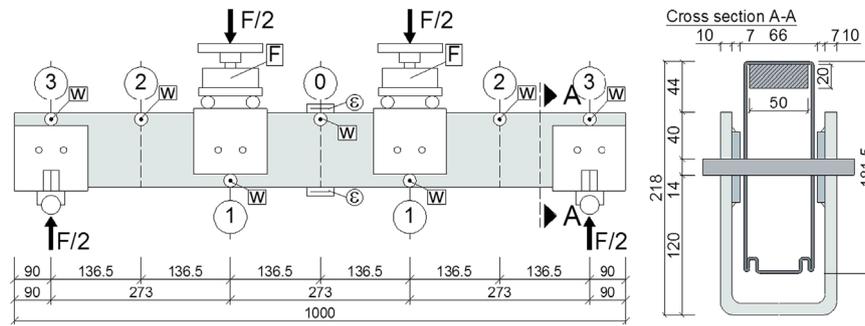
Test setup: façade reinforcement, dimension in mm.
